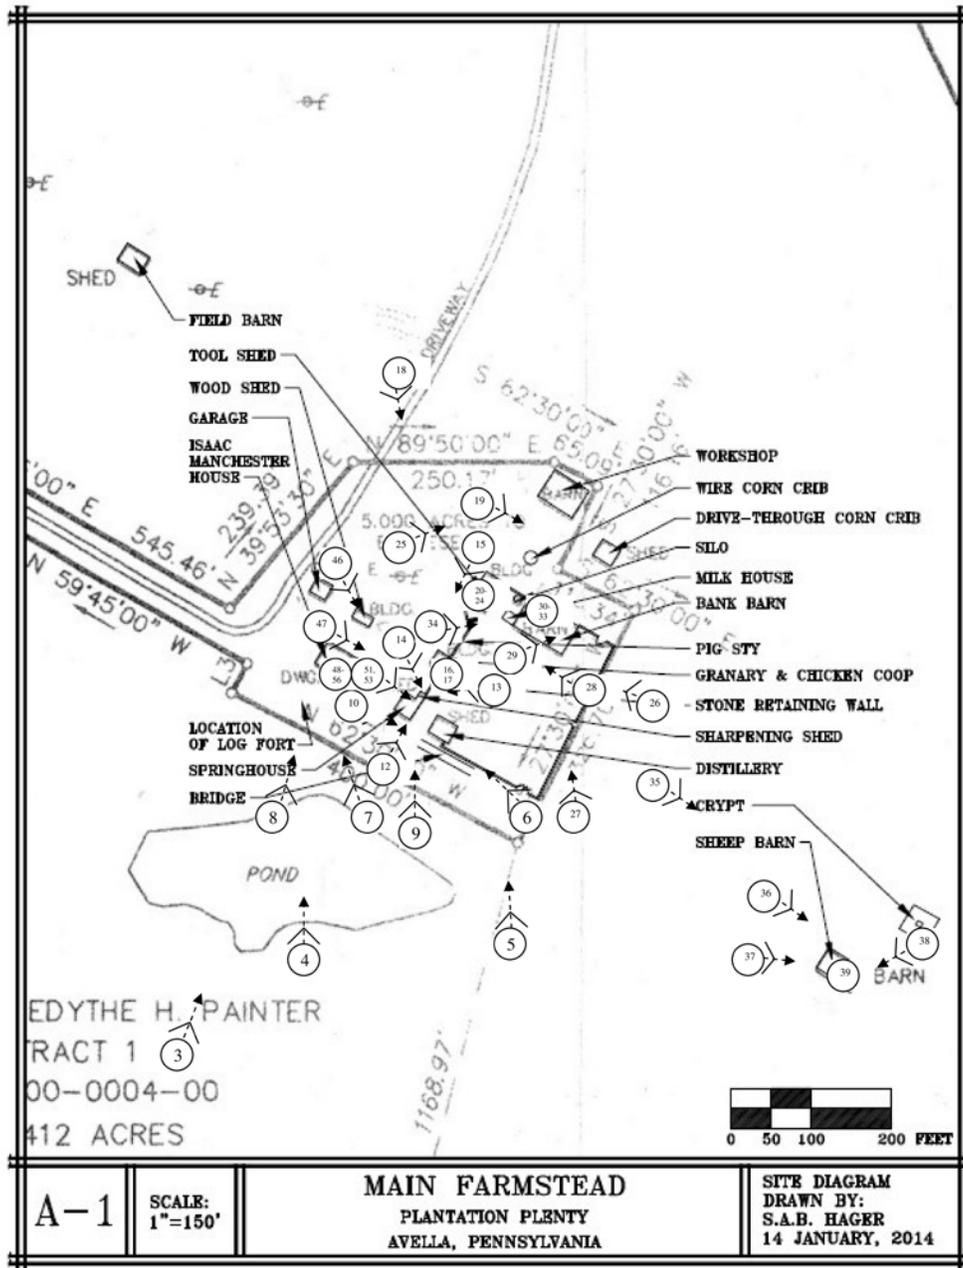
Plantation Plenty Original Farmstead Photo Key Plan
